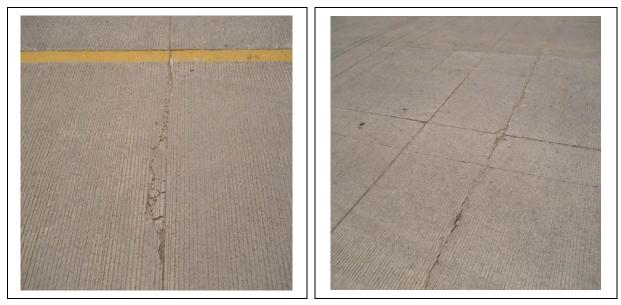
Joint Spalling and Transverse Cracks on M-99 from MDOT Warranty Report SWAD 2870 (2011)
